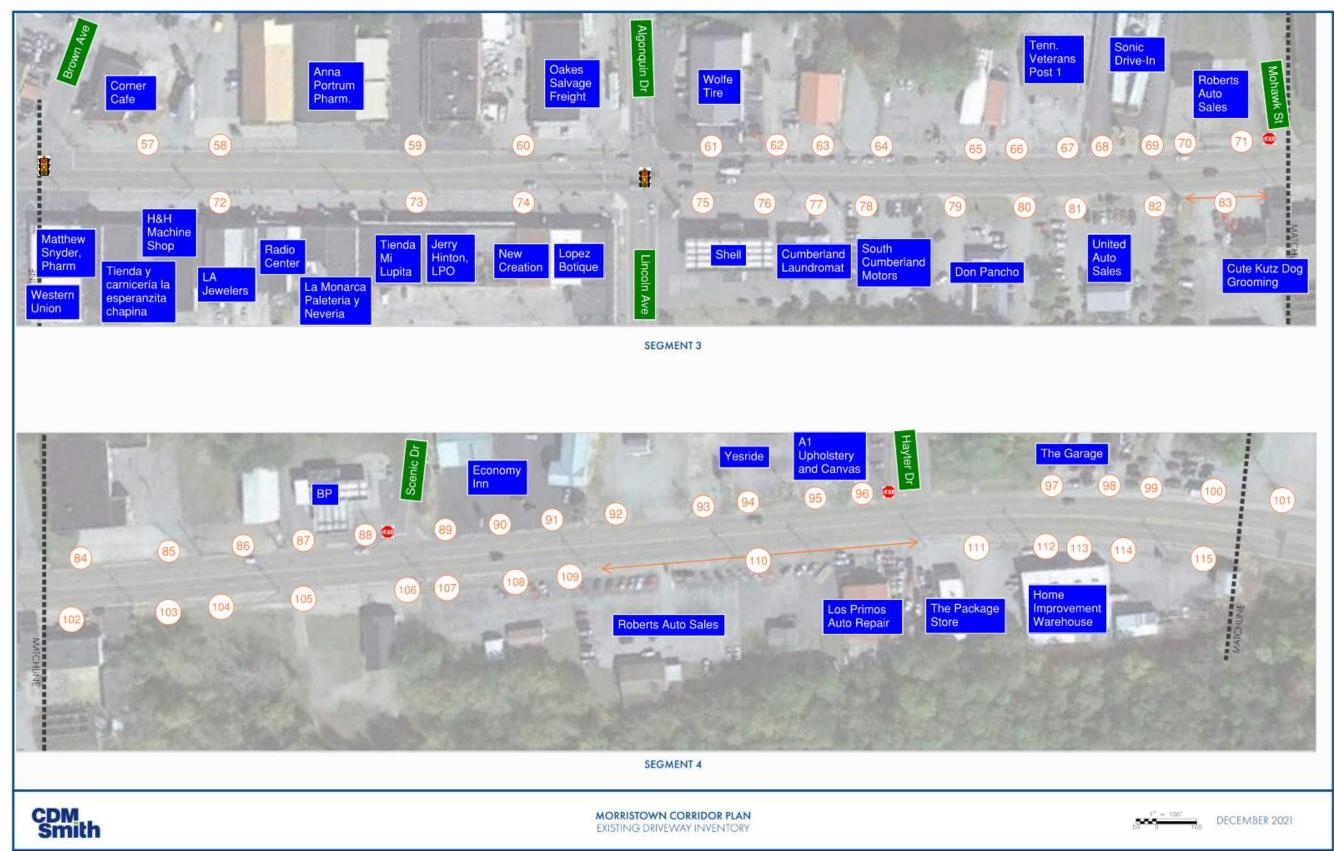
Existing Driveway Inventory Sheet 2 of 3 (Segments 3 and 4)
